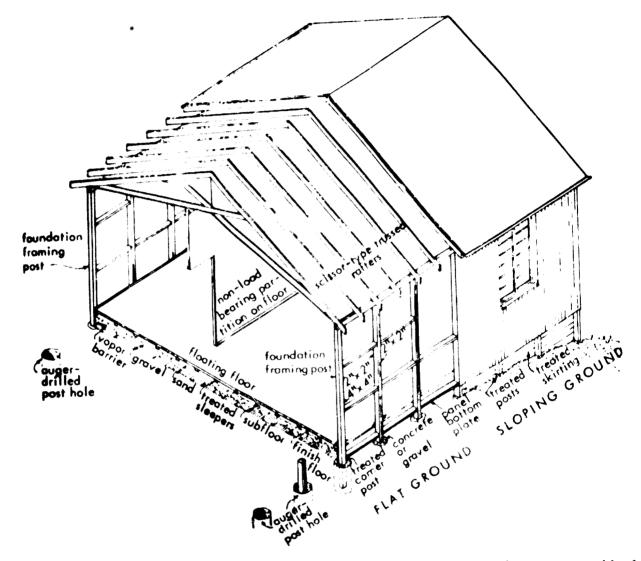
Proposed integral wood foundation framing post house construction system, combined with floating wood floor and trussed rafter system.
